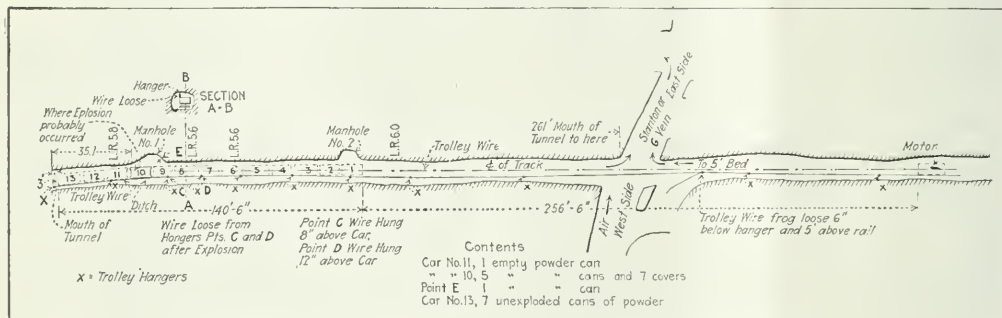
PLAN AND CROSS-SECTION OF THE BALTIMORE TUNNEL, VIEWED FROM THE INSIDE LOOKING OUT
